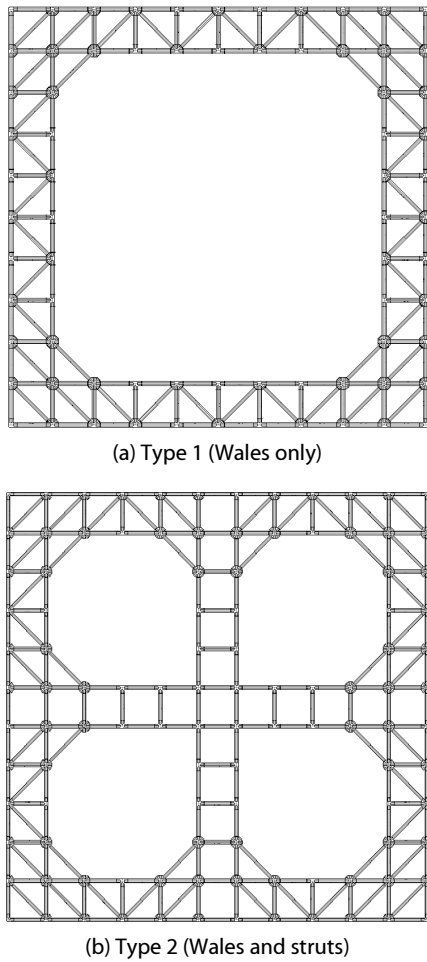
Examples of PCT (Precast Concrete Truss) system
